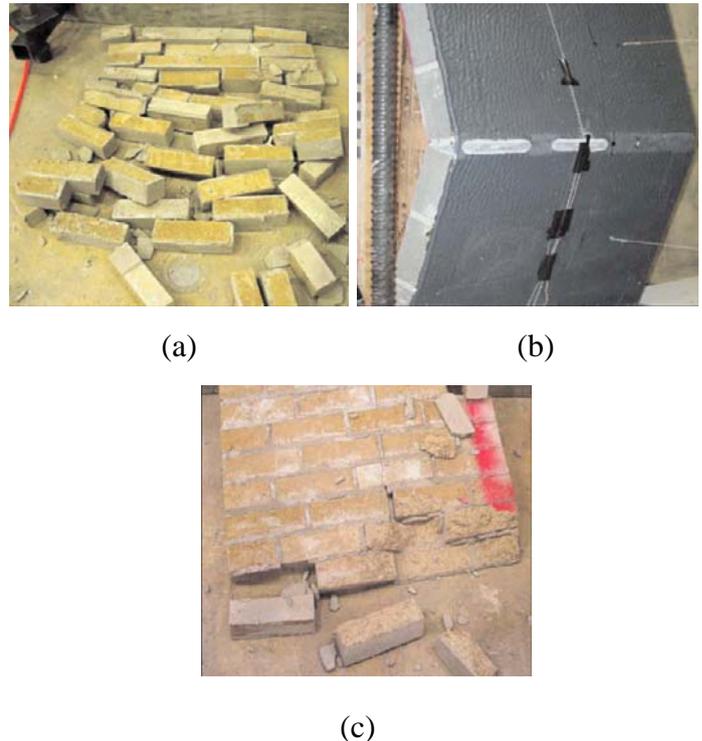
Wall failure mechanism: (a) debris scattering of the control wall; (b) polyurea coated CMU wall undergoing flexure; and (c) collapse of the GFRP-polyurea retrofitted WFFA wall, from Hrynyk & Myers (2008).
